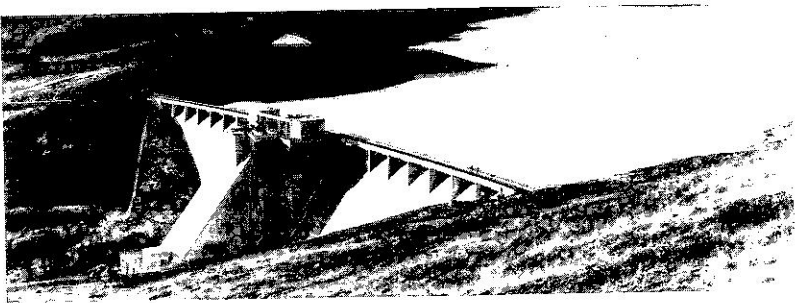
ORRIN DAM—THE SPILLWAY AND EMBANKMENT DAMS FROM THE NORTH BANK
